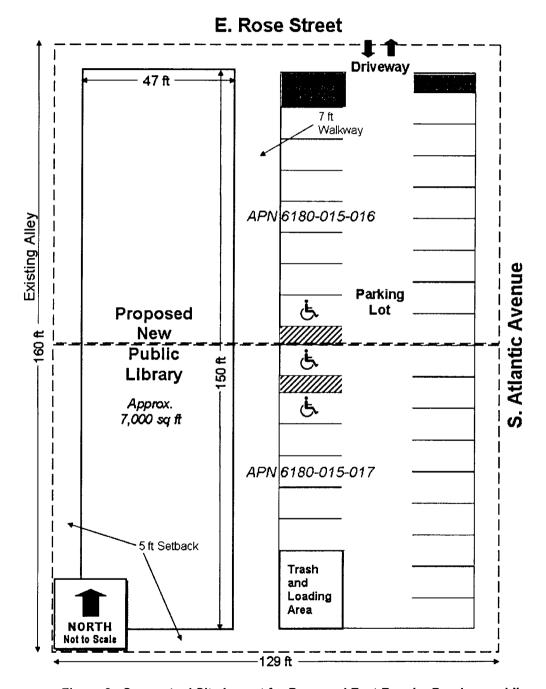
Conceptual Site Layout for Proposed East Rancho Dominguez Library
